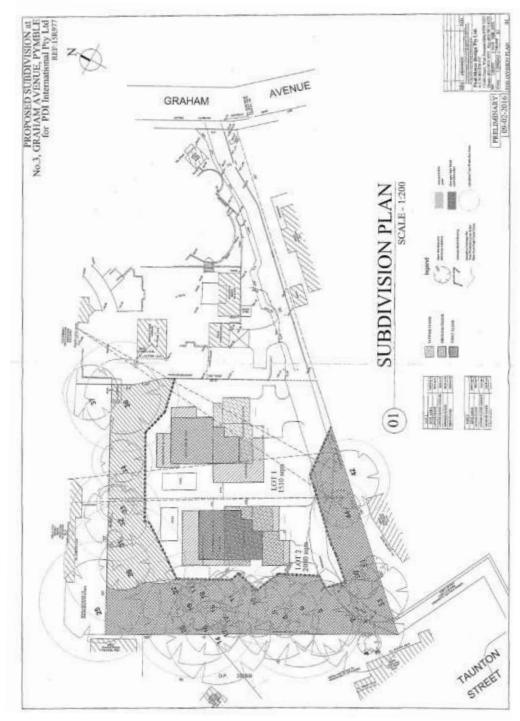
the proposed subdivision pattern forming this application is shown in this subdivision plan by Paul Meyer Design.
